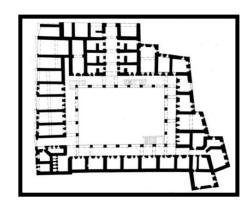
Cuhacı Han plan with out retail unit addition in the yard [39]
